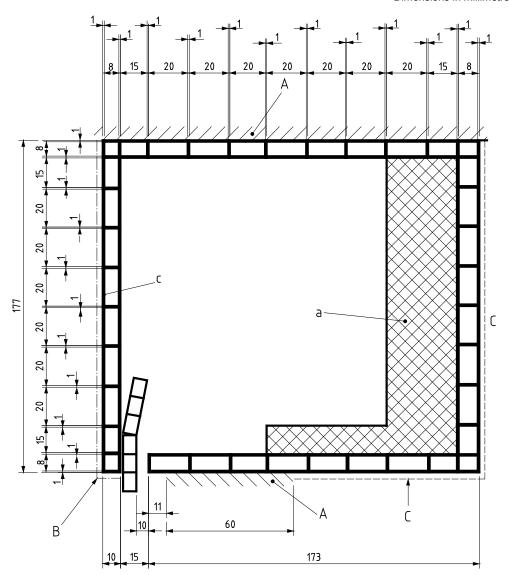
Roller shutter box ($b_{\rm sb}$ = 177 mm)
